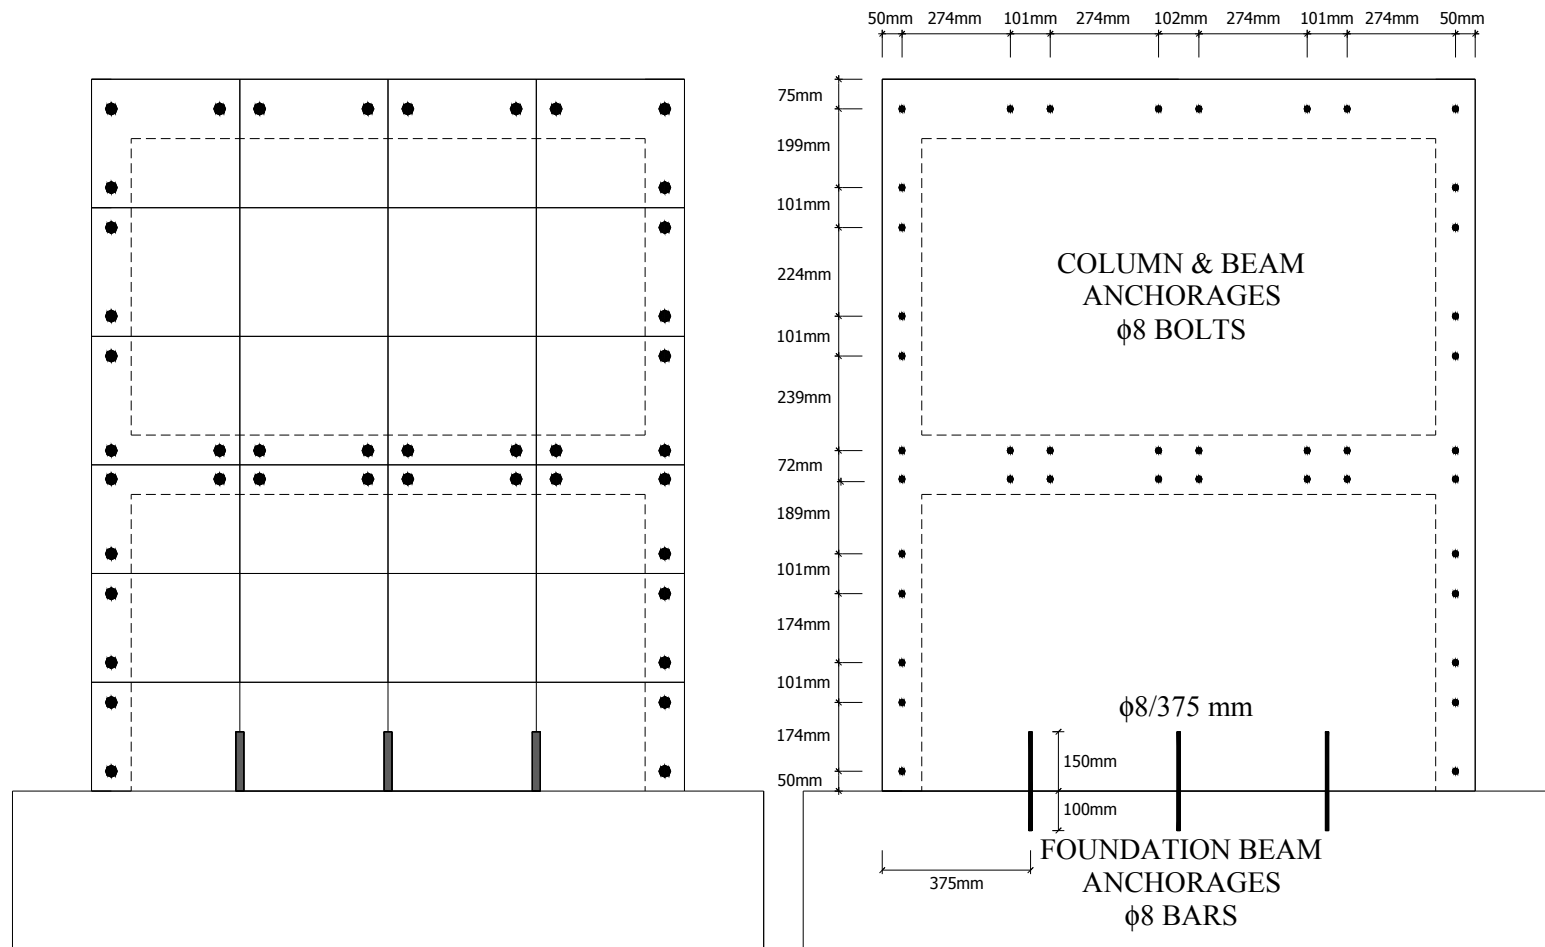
Panel arrangement and configuration of the dowels for Specimen CEE4
